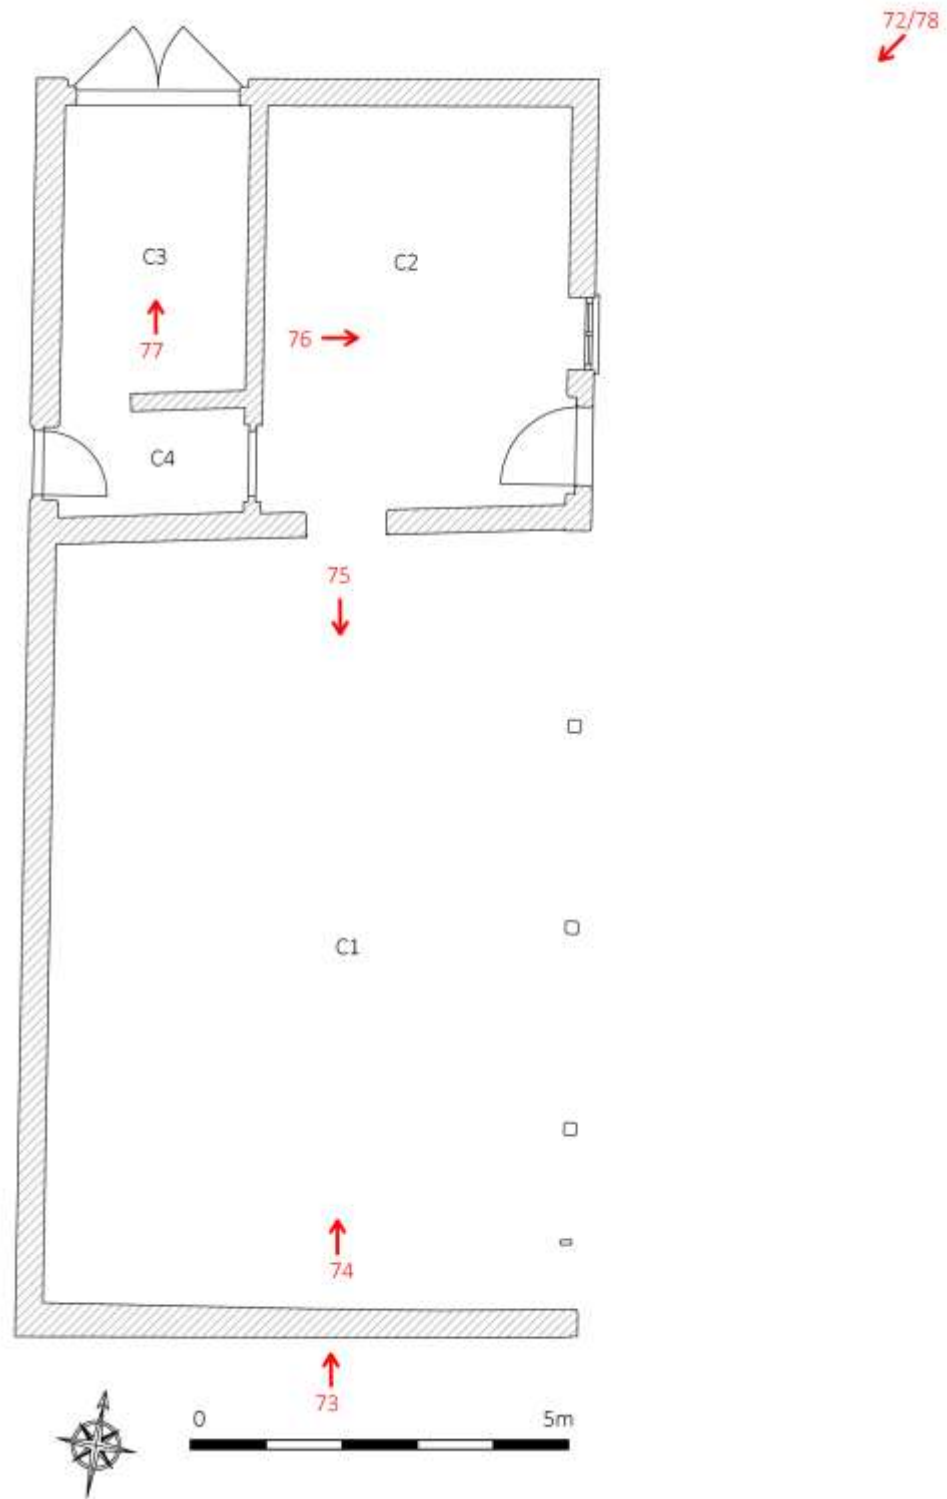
Cart shed floor plan showing photo views (scale 1:100)
